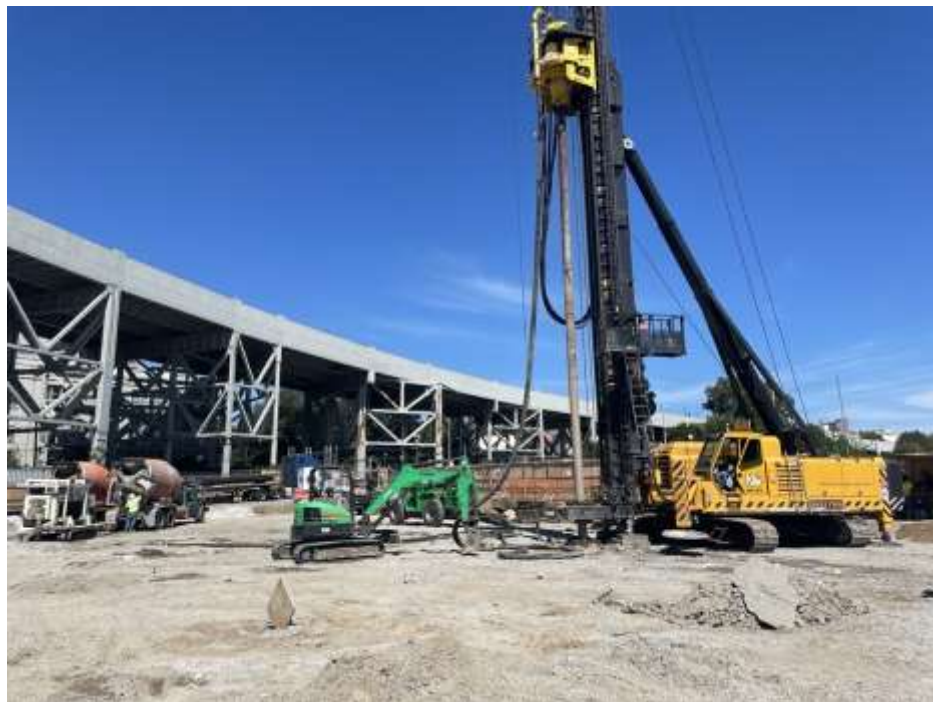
Morris-Shea advancing piles in the central part of the site (facing northwest).
